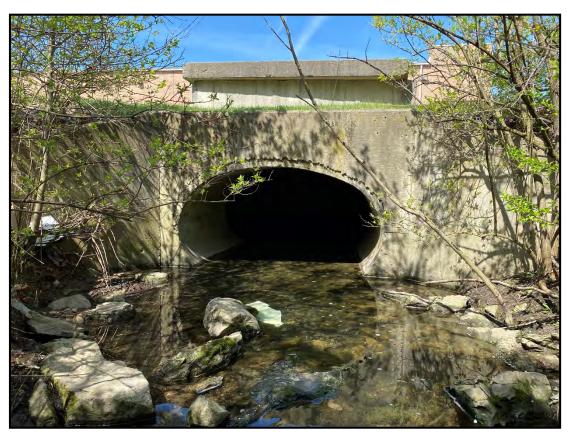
Westerly view at the beginning of Stream 10 on the Central Section of the evaluation area.
